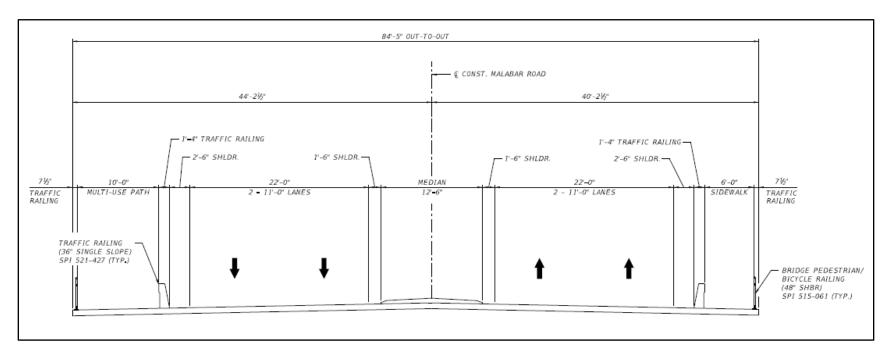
Canal C-10 Bridge – Alternative A Minimum Right-of-Way and Flush Sidewalk
